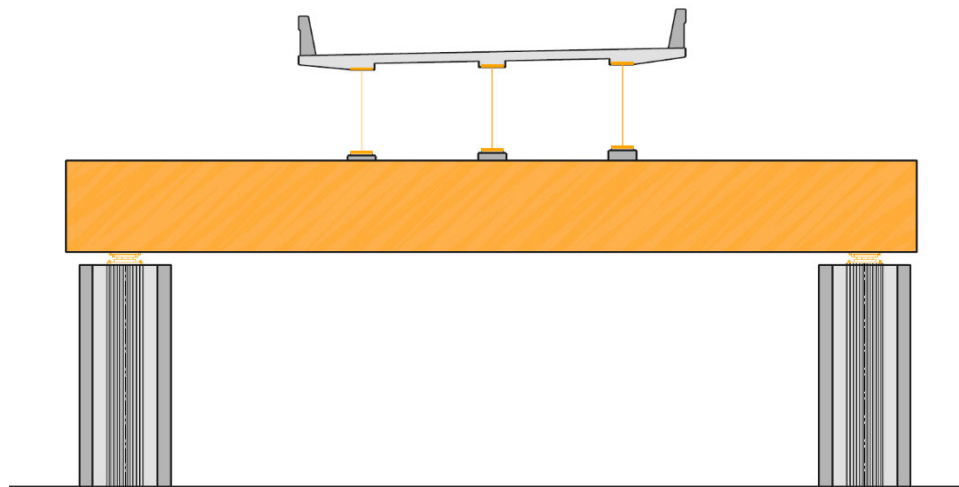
Typical Straddle-Pier – Piers 4 and 17
